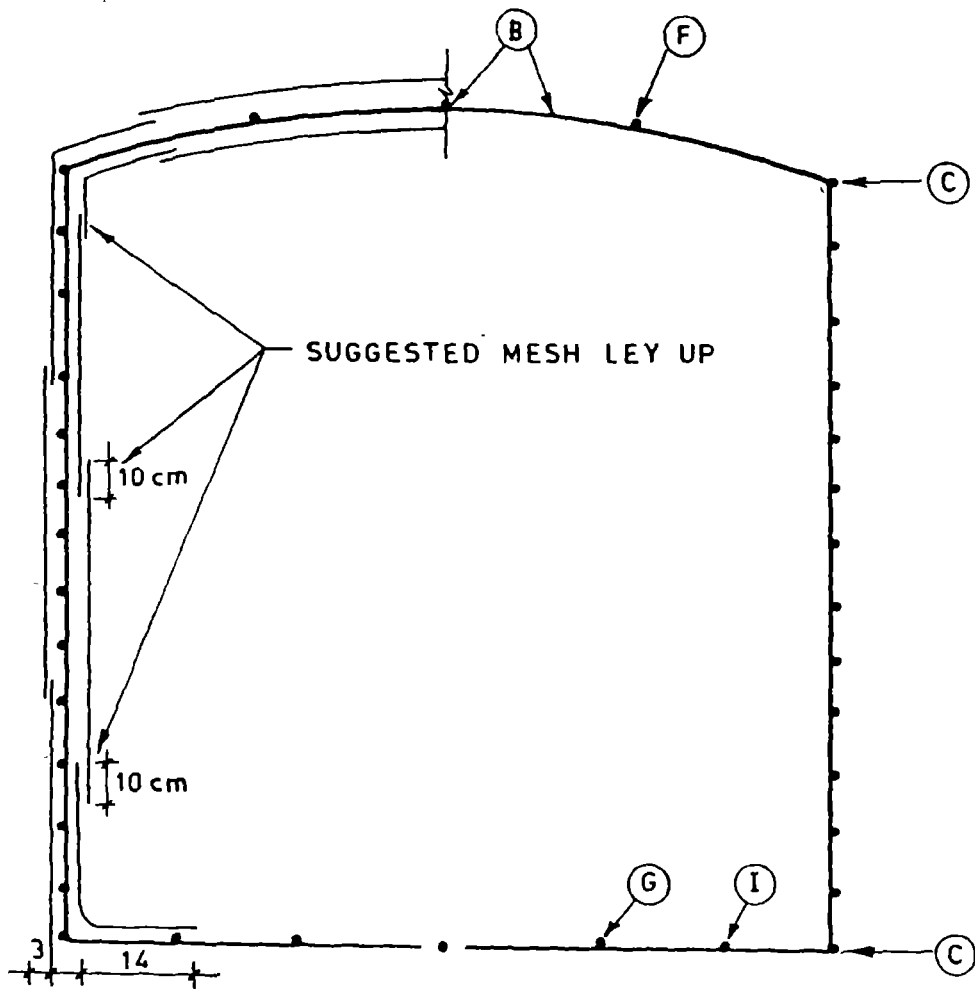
CROSS SECTION OF STEEL REINFORCEMENT
